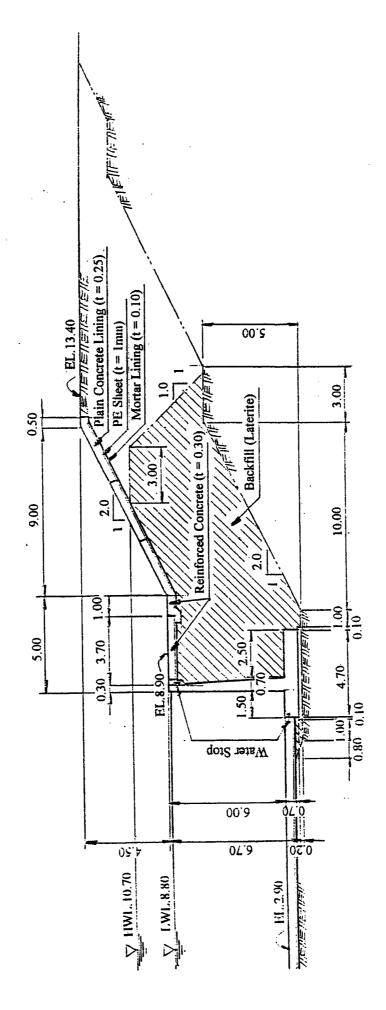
Typical Cross Section of Inverted T-Shape Type (1)
